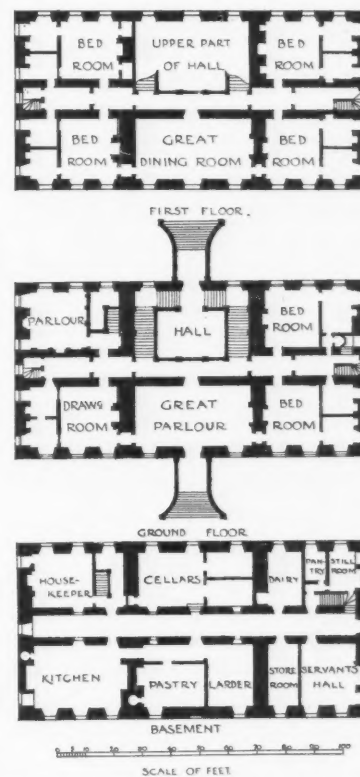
Plans of the basement, ground- and first-floors at Coleshill.
